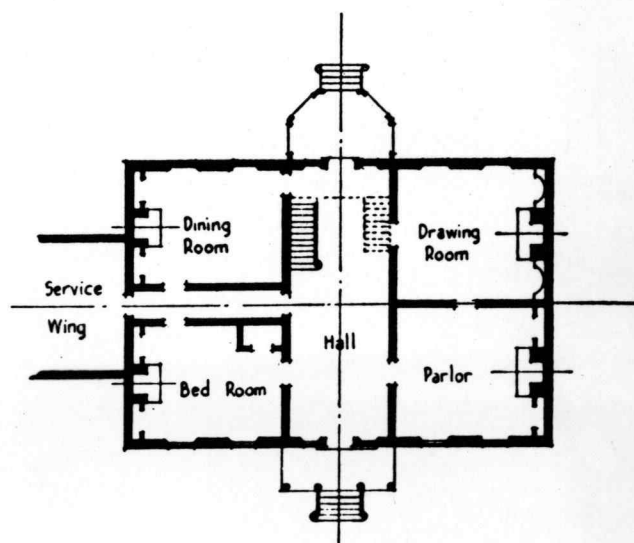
First floor (one of three floors) house plan of a typical Early American eighteenth century house.
